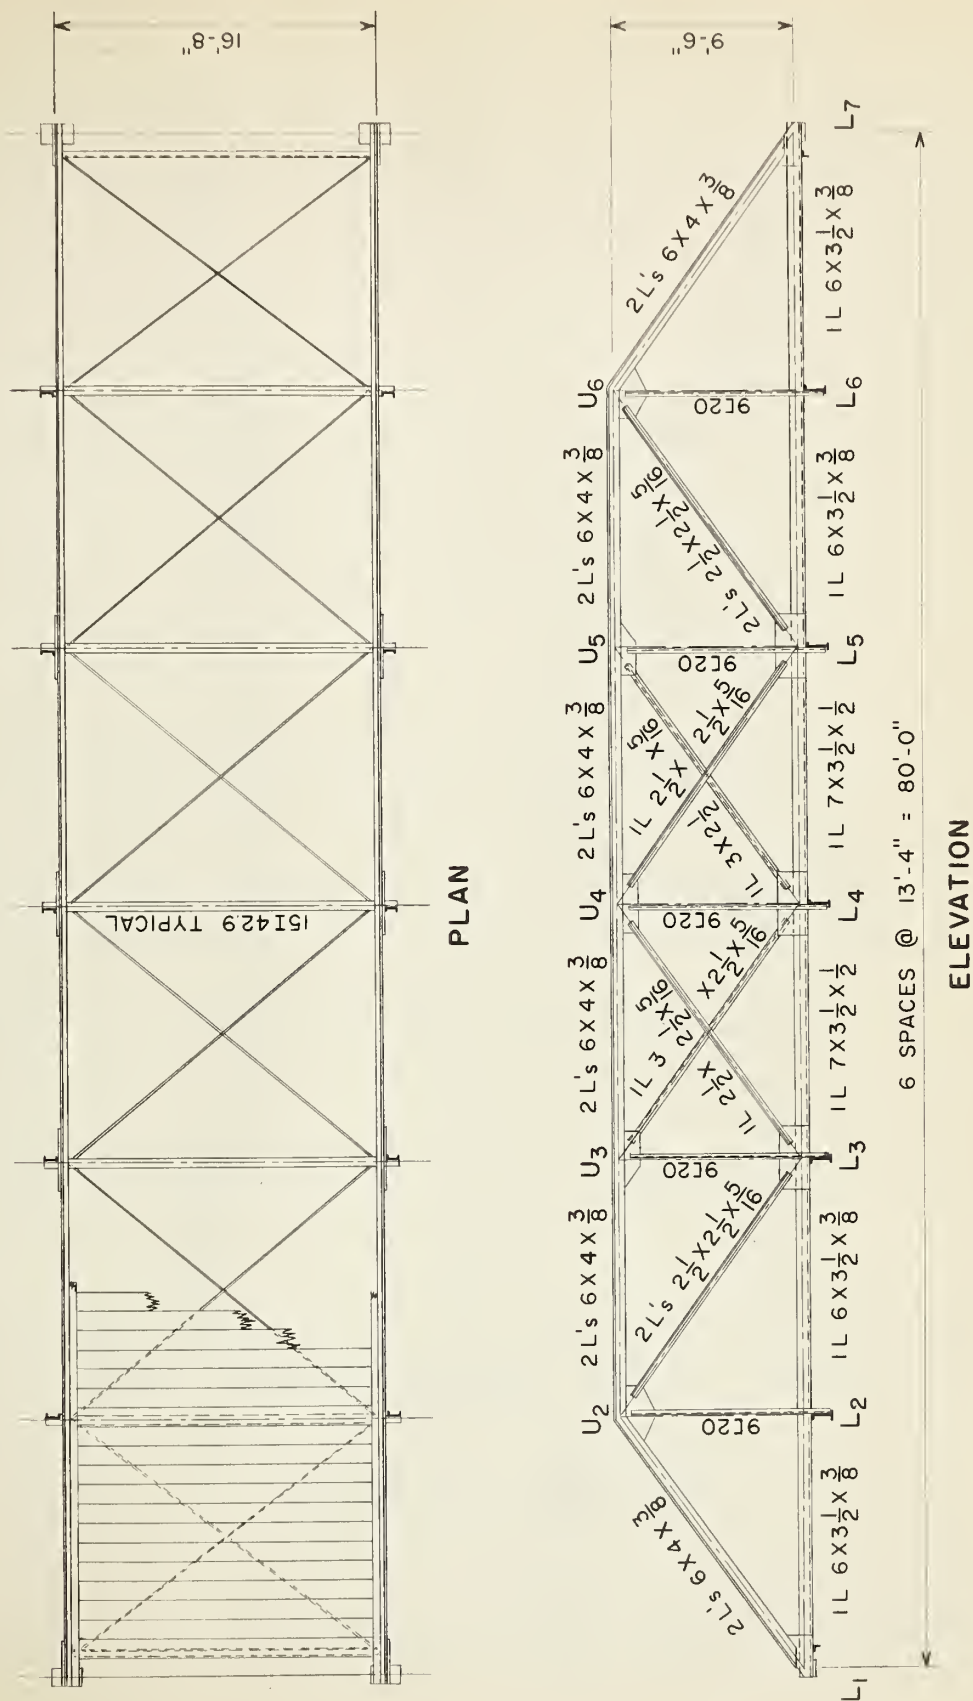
DESIGN DRAWING OF TEST BRIDGE
